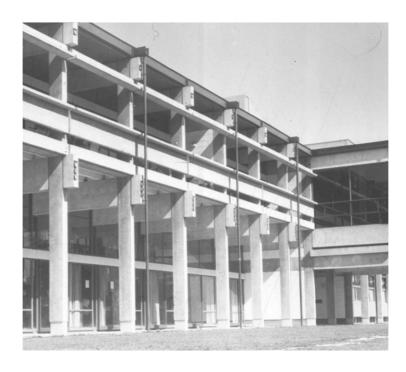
Example of building constructed in New Zealand with post-tensioned system 1 (Courtesy of R. Park)
